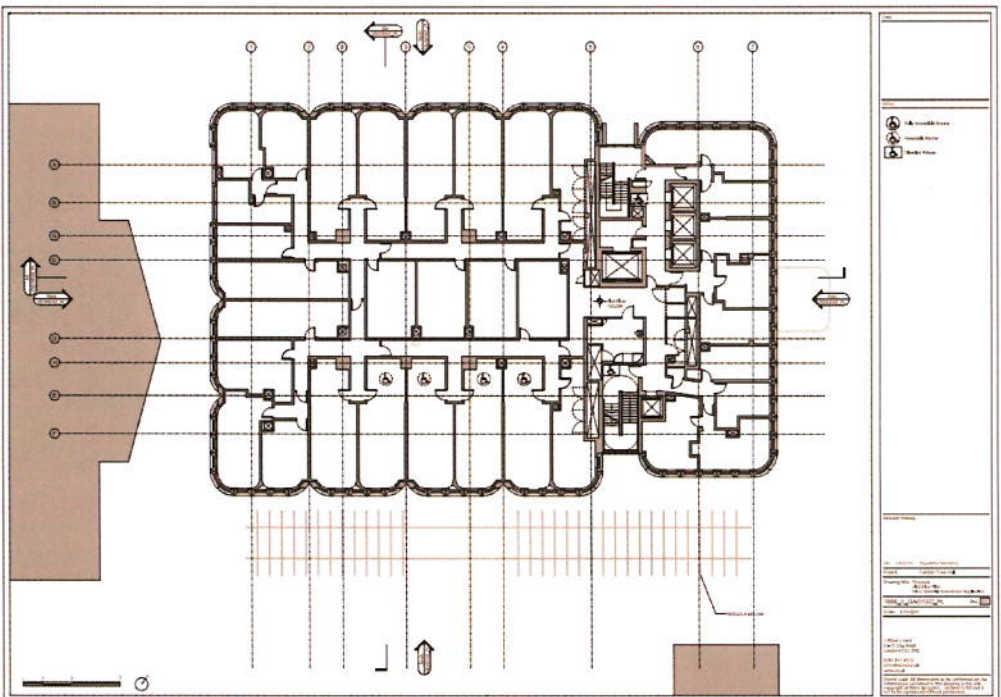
Approved Floorplan showing the hotel rooms in relation to the Camden Centre (Ref: 2016/0410/P)
